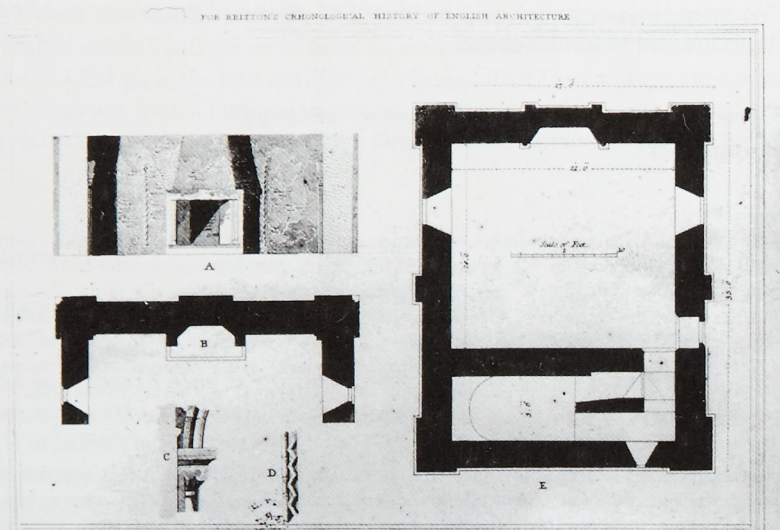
Ground-floor plan, partial first-floor plan and an internal elevation (east wall, first floor) of Winnold House in its Period III form, published in 1819 and included in John Britton's *Chronological History and Graphic Illustrations of Christian Architecture in England* (London 1827, 25). It is accompanied by an engraving taken from the view presented below as Fig. 4.
